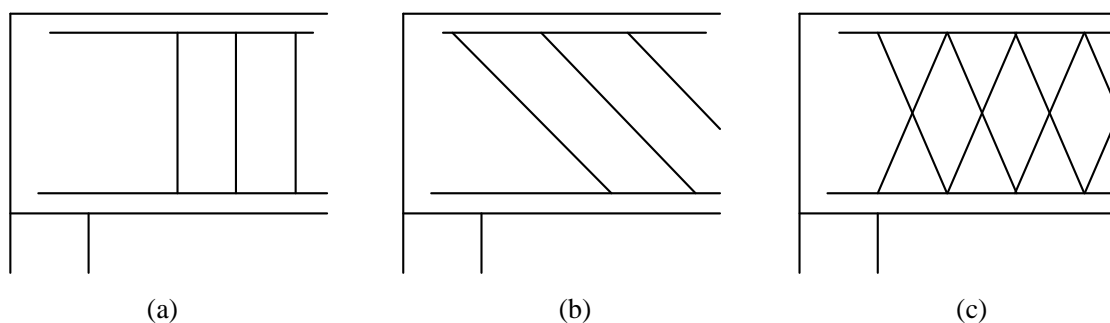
Different shear reinforcement: (a) stirrups, (b) inclined reinforcement and (c) lacing.
